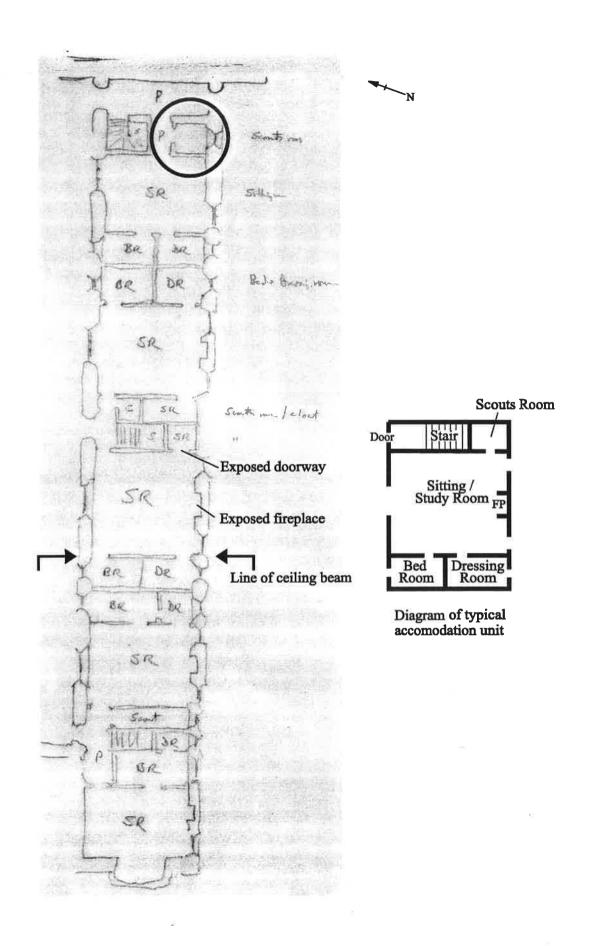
1848 James King plan of Wadham College MS Top Oxon a 22 plan XVIII
